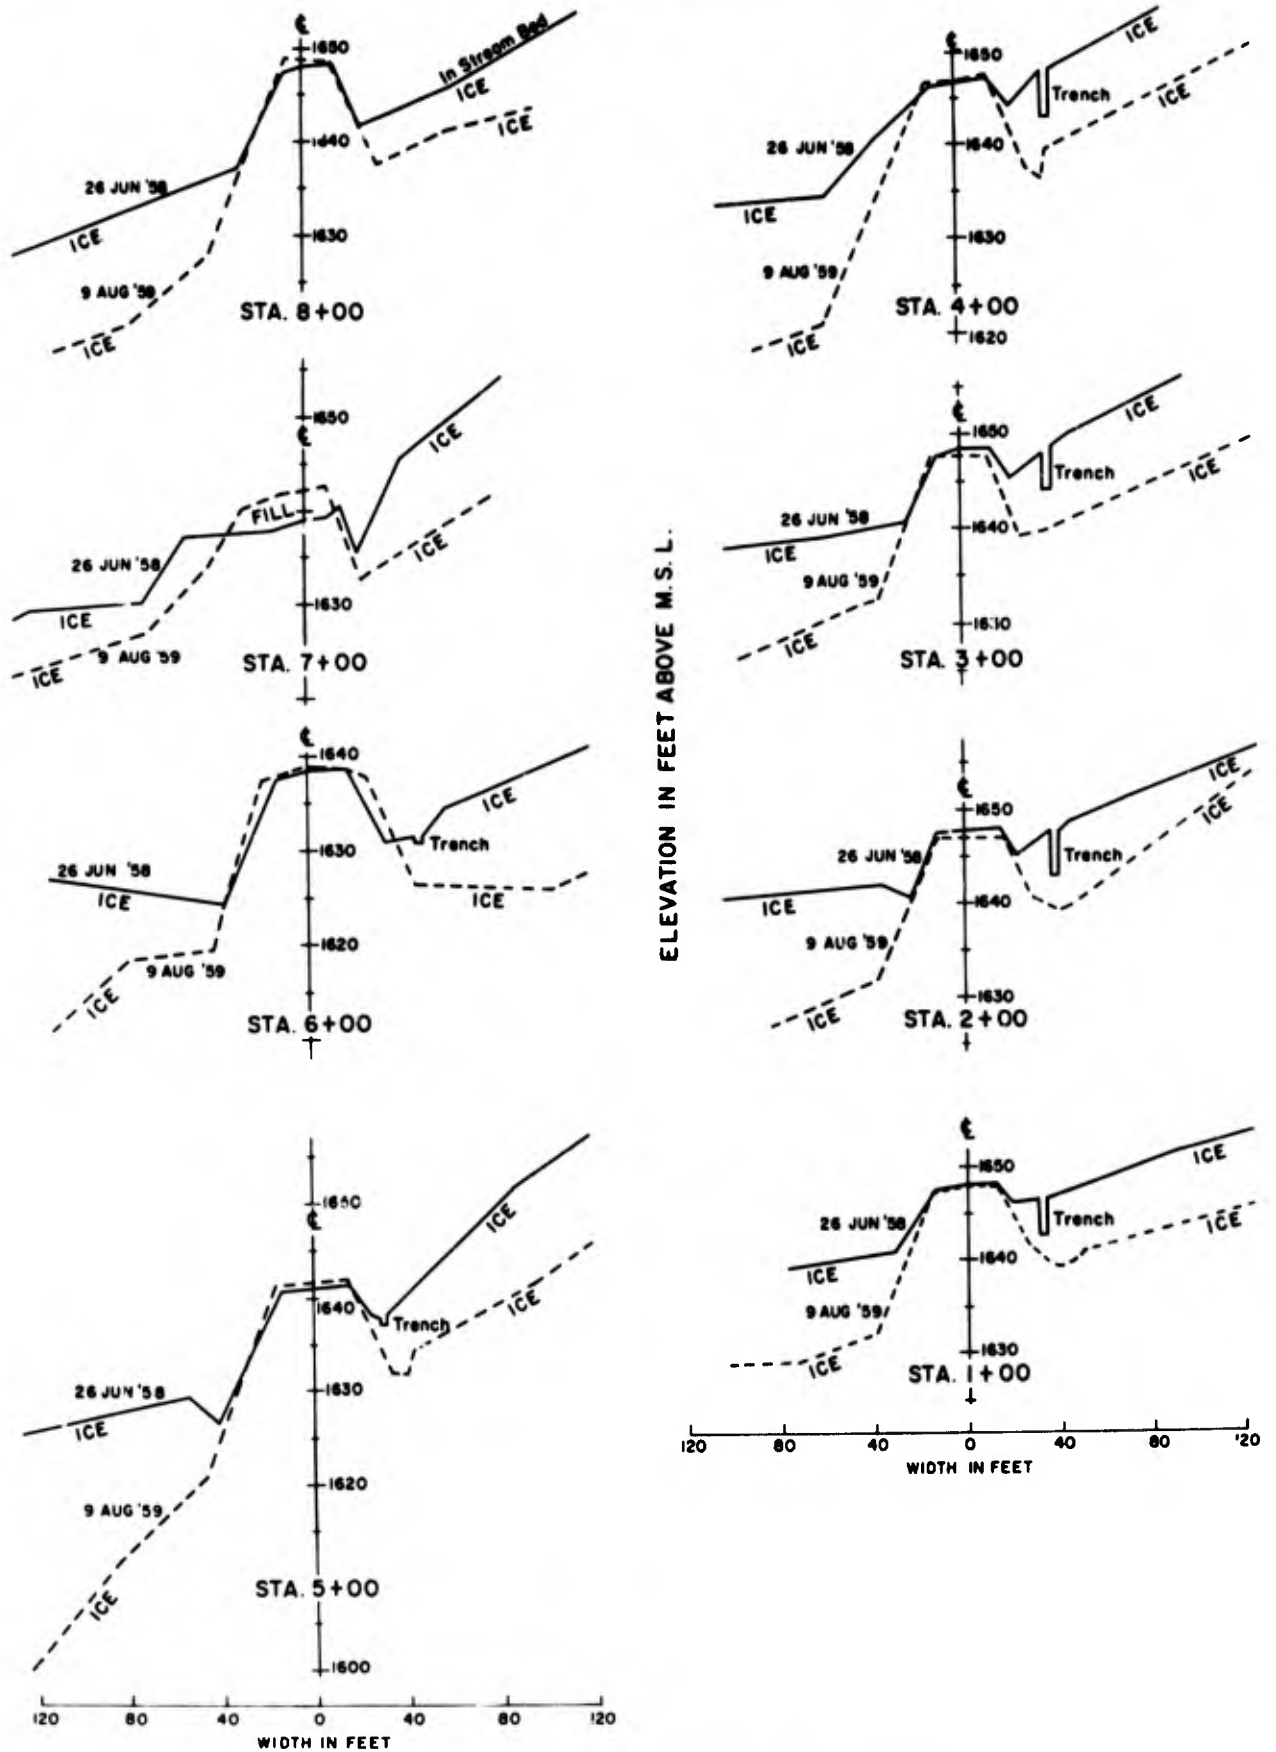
Cross sections of Ice Tunnel Road, 1958 and 1959.
